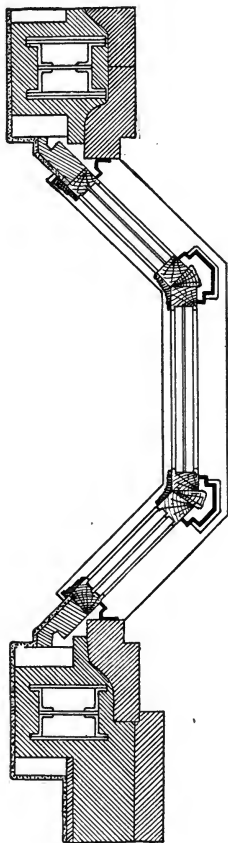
Plan of Bay Windows, Fifth to Eleventh Floors. Gillender Building.
